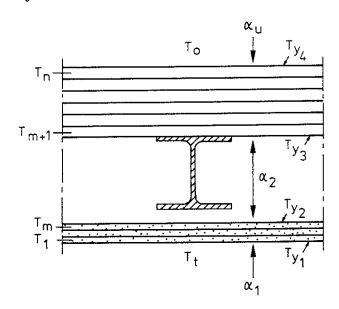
Division of slab and suspended ceiling into elements
